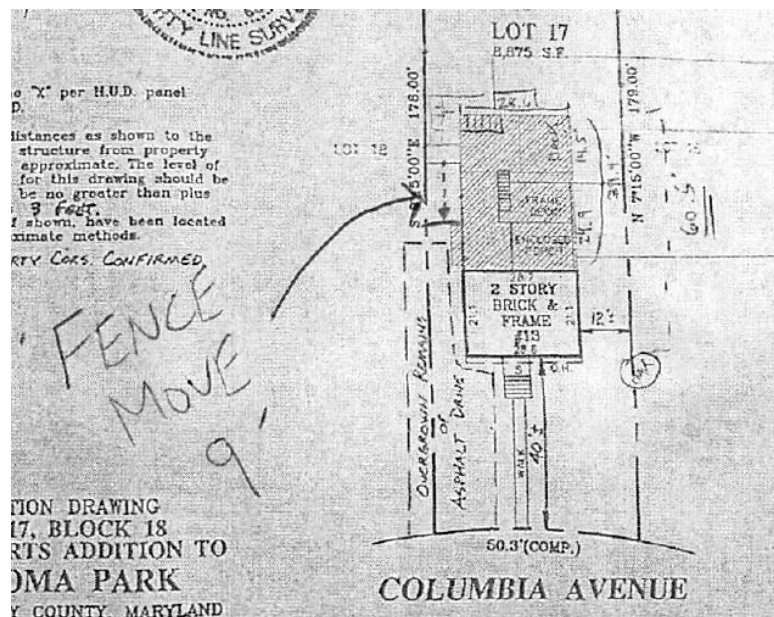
Site plan showing the existing fence to be replaced and proposed fence location.
